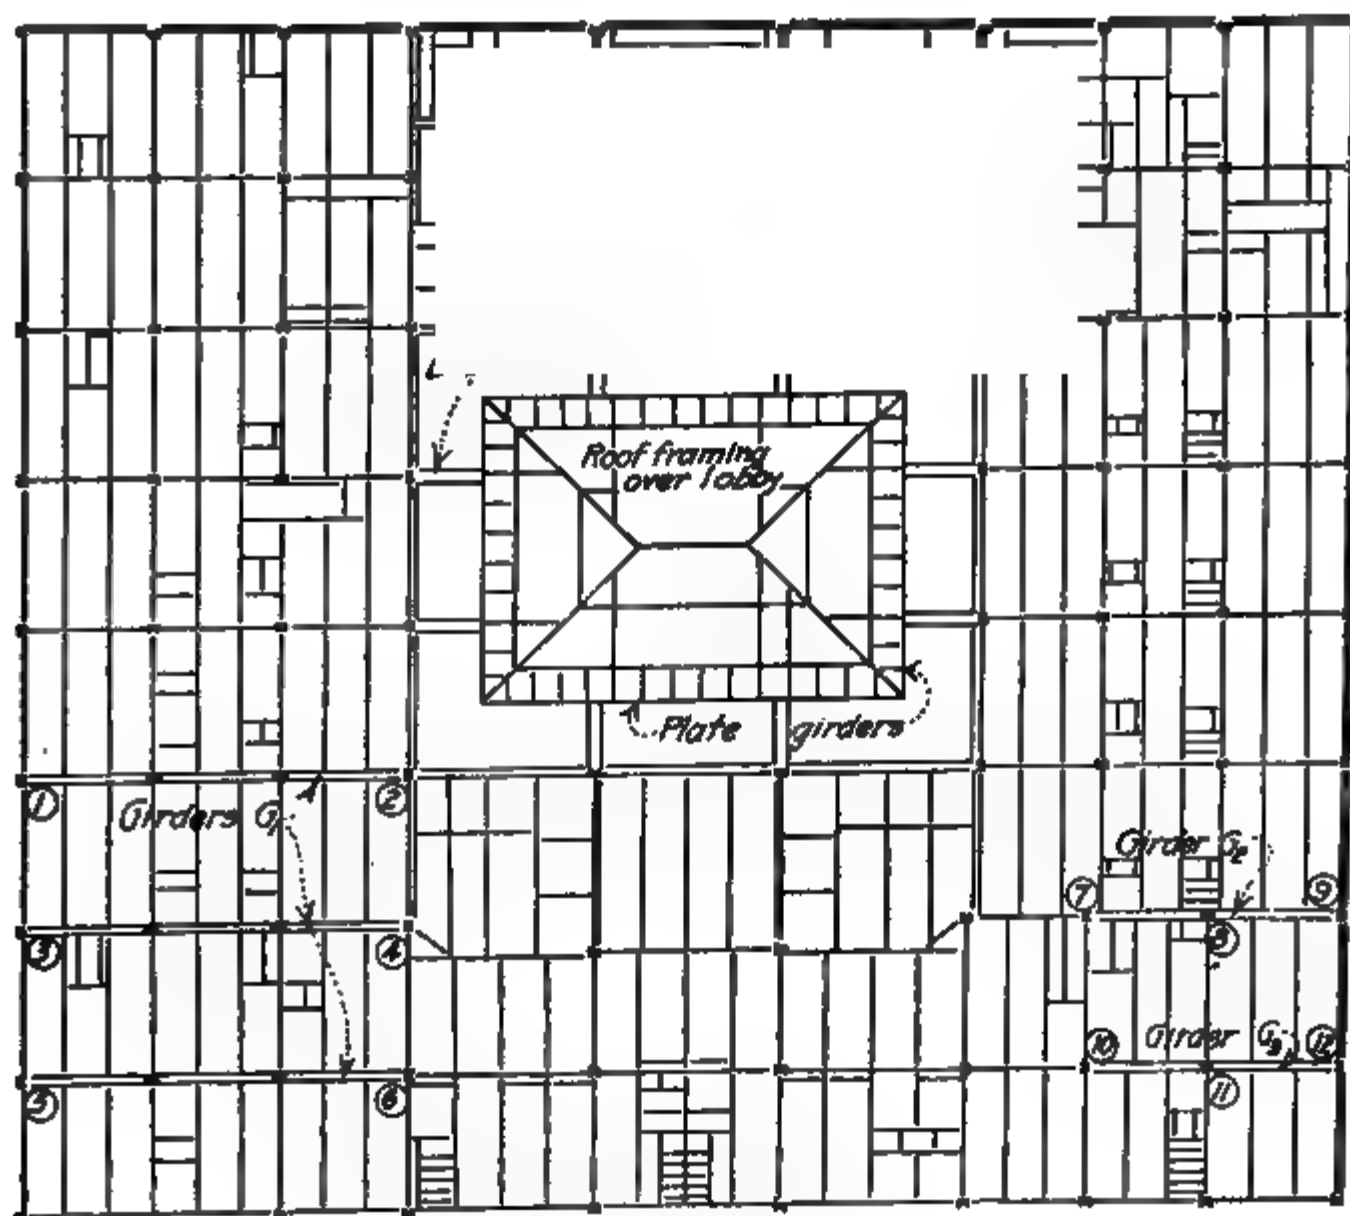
Second floor plan, La Salle Hotel, Chicago, Ill.
